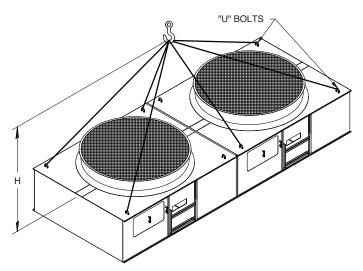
Lifting of fan section, two-fan units— "H" Dimension
